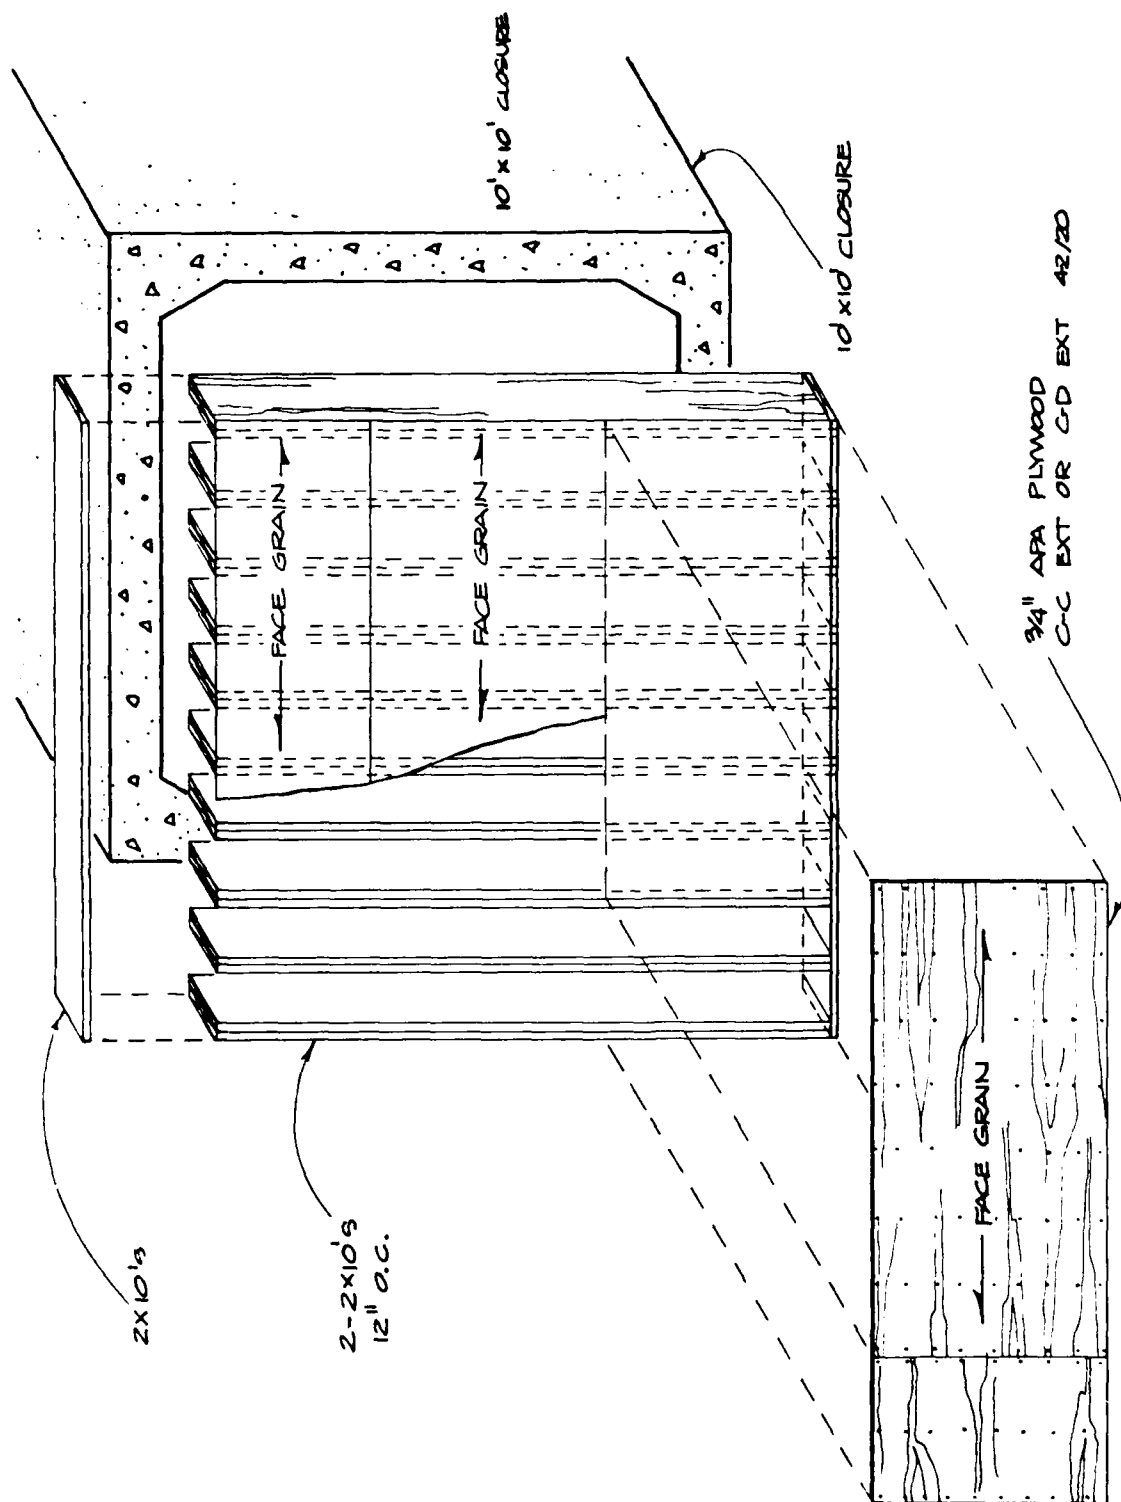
Typical Closure for a 10 ft by 10 ft Box Culvert For 2 psi.
